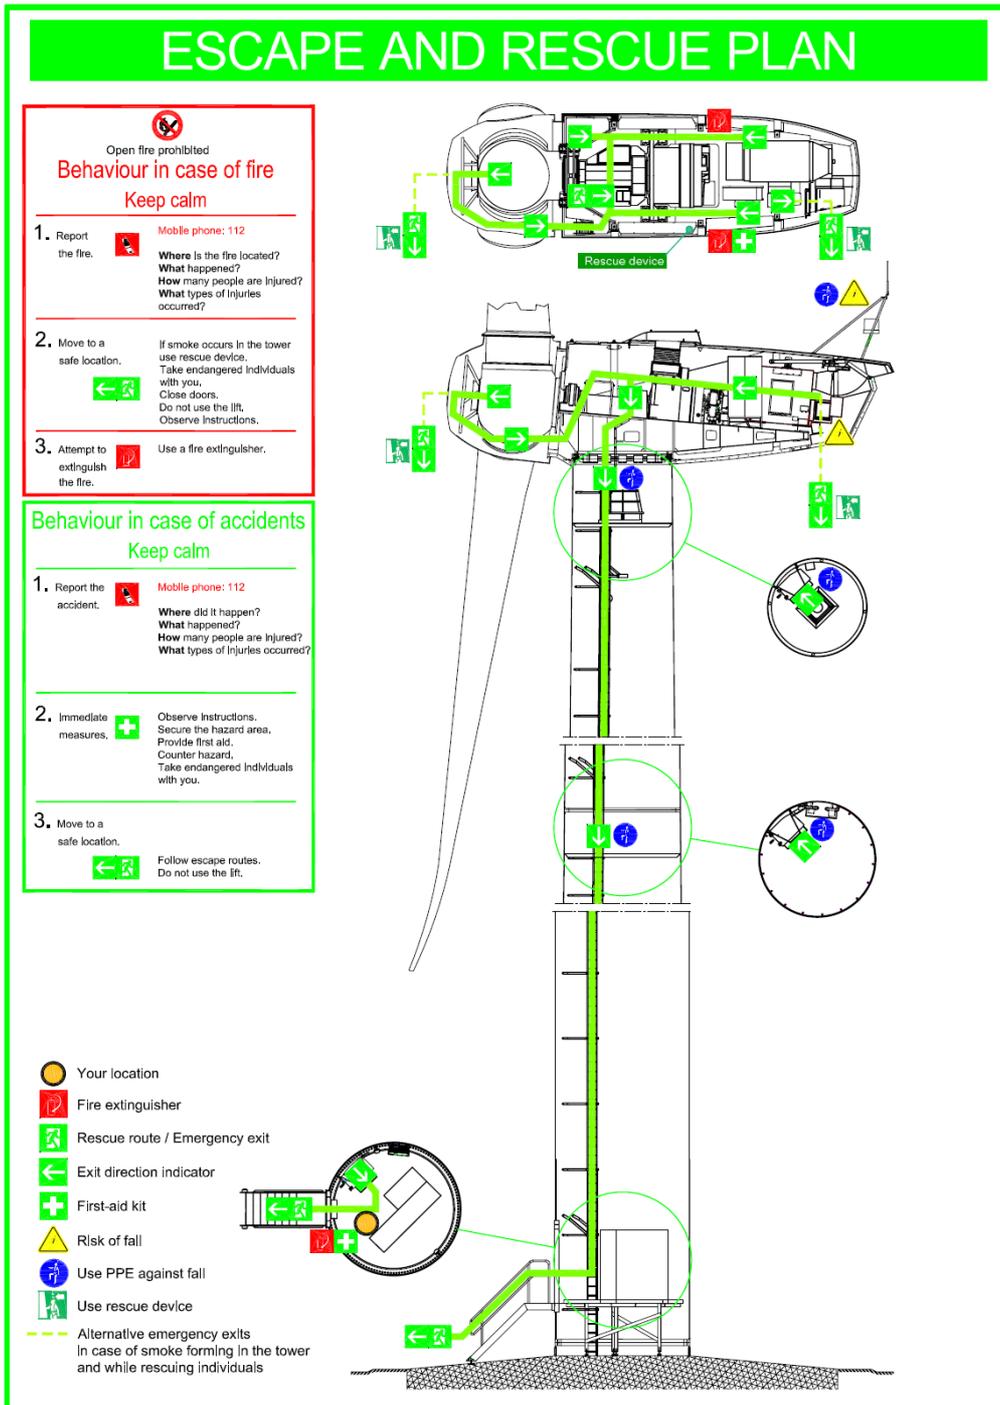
1: Escape and rescue plan – location tower base
